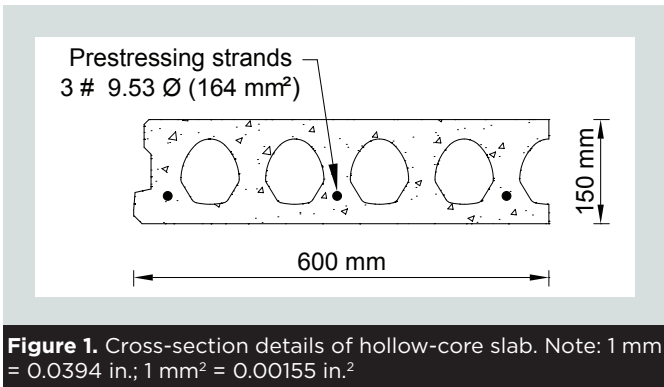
Cross-section details of hollow-core slab. Note: 1 mm = 0.0394 in.; 1 mm² = 0.00155 in.²
